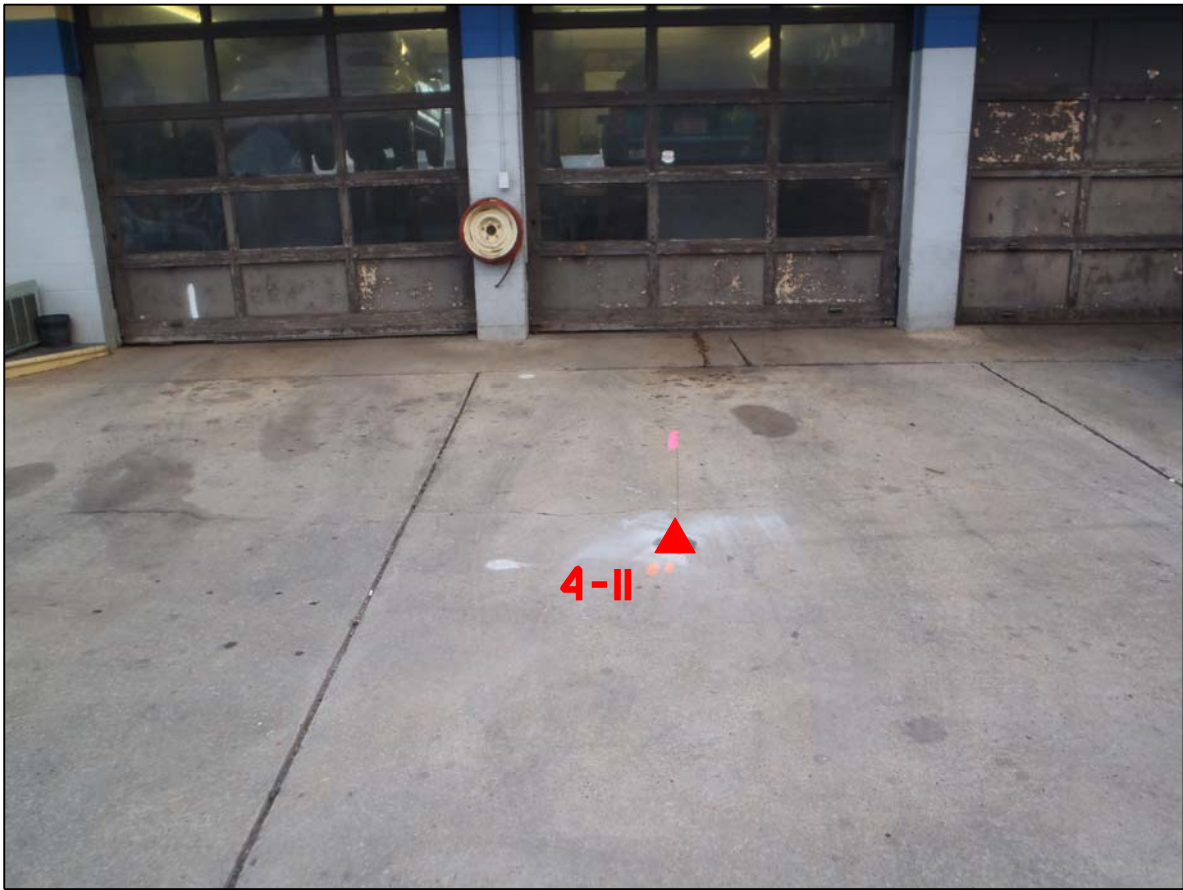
BORING AT FORMER PUMP ISLAND LOOKING SOUTH
